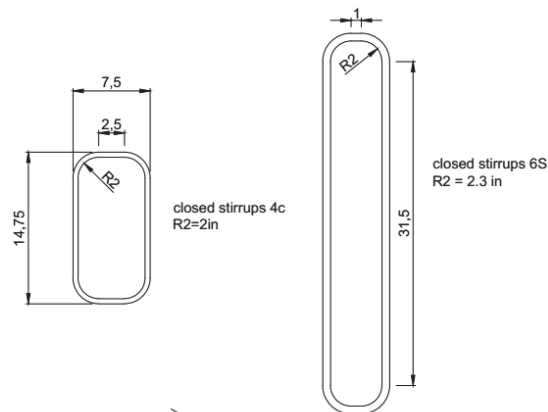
Typical section with vertical close stirrups, minimum $C_c=1.5$ in. All measurements in inches (1in = 25.4 mm)
